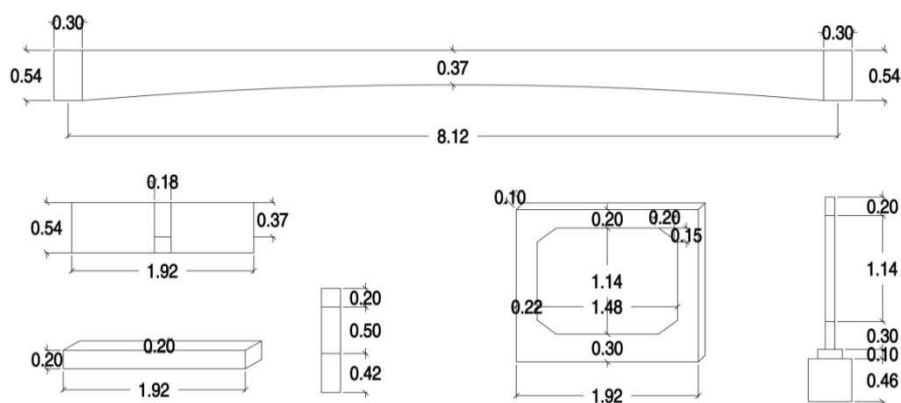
Det 1: End abutment cross-beam at left bottom, Det 2: Intermediate support cross-frame at right bottom, Det 3: Longitudinal I-beam stiffener in mid-span (longitudinal section on top, cross-section on top left).
